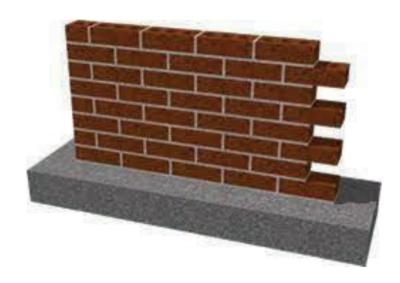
Toothing in a wall to continue construction at a later date (toothing in wall construction - Google Search)
